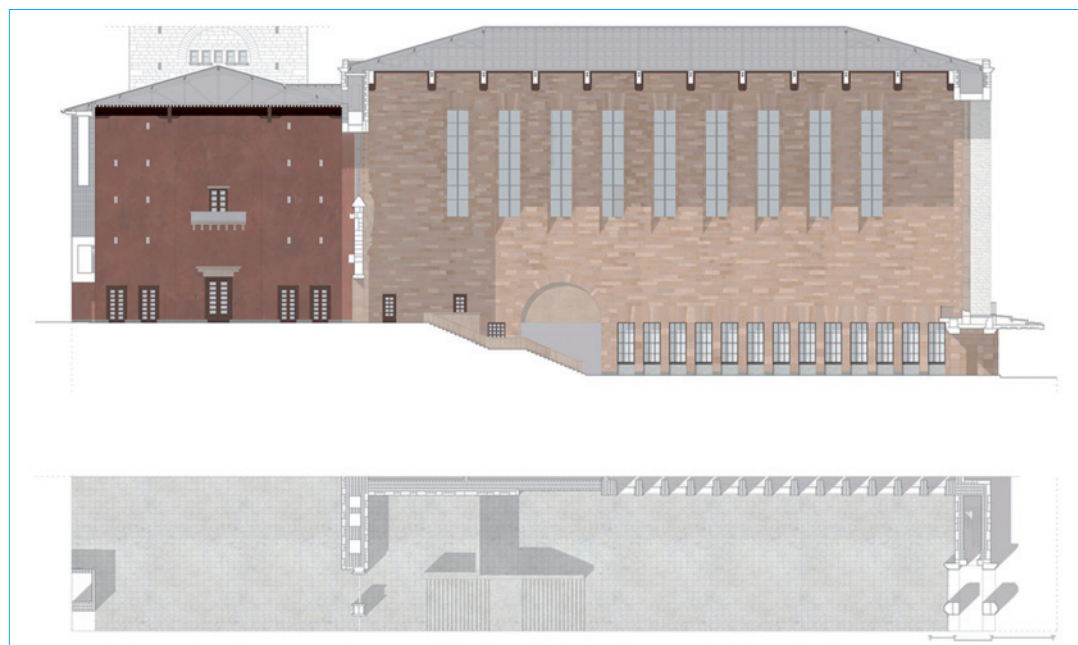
Longitudinal section and plan of the small ticket hall (Kleine Schalterhalle) at the time of the first version of the building (1928). Made by M. Balestra, M. Carbone, L. Fornarelli, F. Franciolapilla, L. Musiaio Somma, A. R. Saponara, F. Strada
